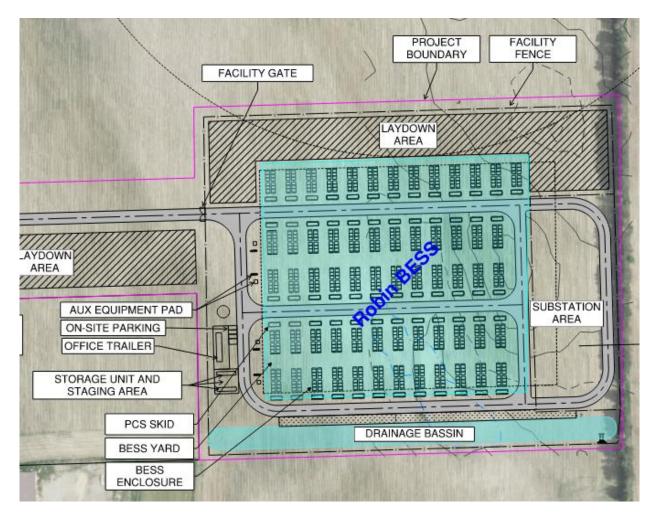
Close-up Plan for the Robin BESS Facility. Adapted from [3].
